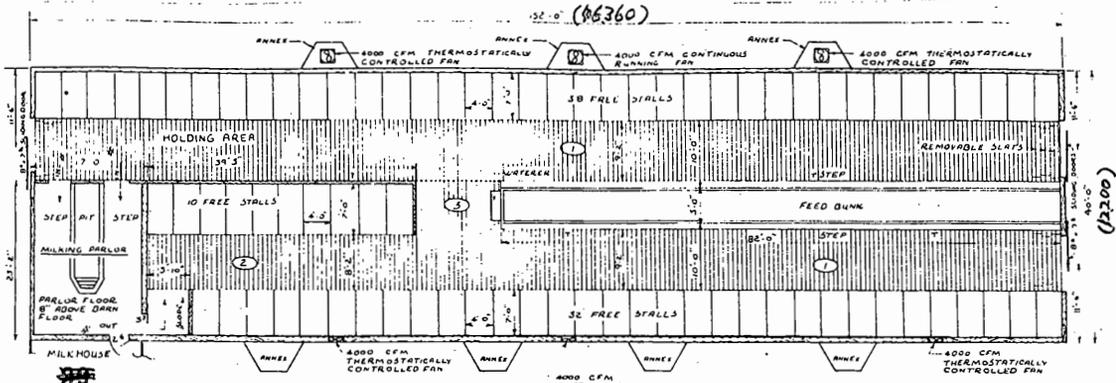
Floor plan for an 80-cow slat floor free-stall dairy barn with manure storage under the complete housing area. Note the location and capacity of the exhaust fans for the ventilation system.
